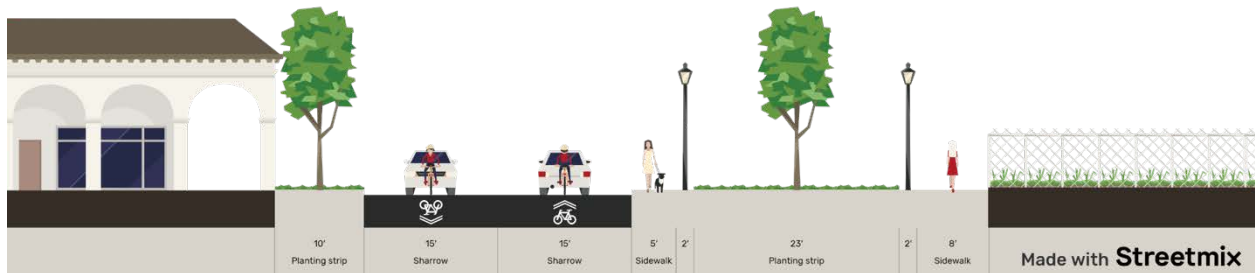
Proposed cross-section of Stevens Street looking north, by the basketball court. This new design adds a sidewalk along the driveway. It includes a shared bike lane with a driveway. Bike sharrows will be added to the road. It also suggests restricting on-street parking; the drive lanes will become wider. It proposes to add street light infrastructure along the sidewalk. Diagram created in Streetmix by EC, 2022.
